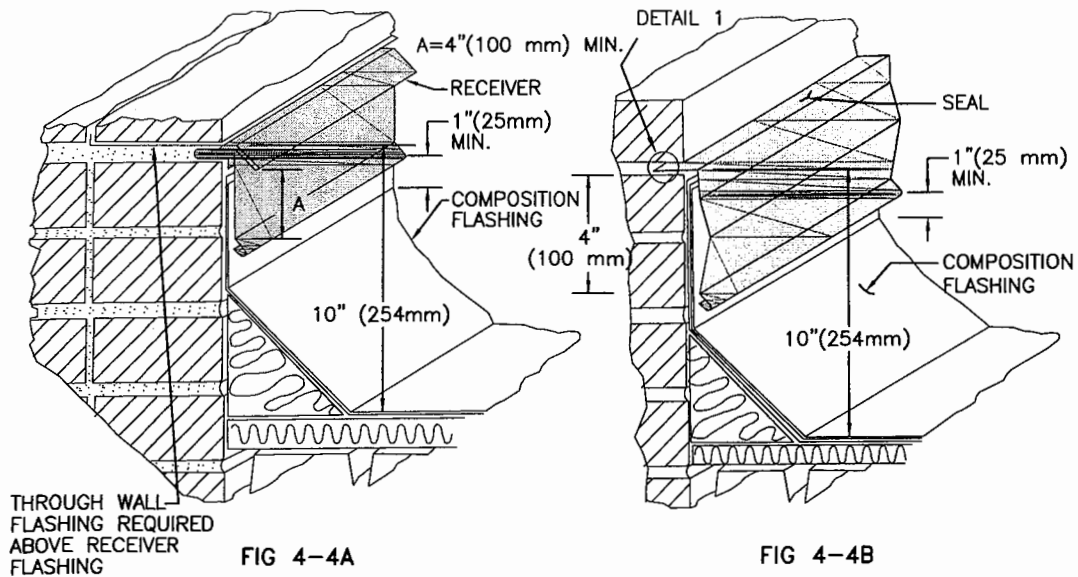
COUNTER FLASHING SYSTEMS — INSTALLATION
